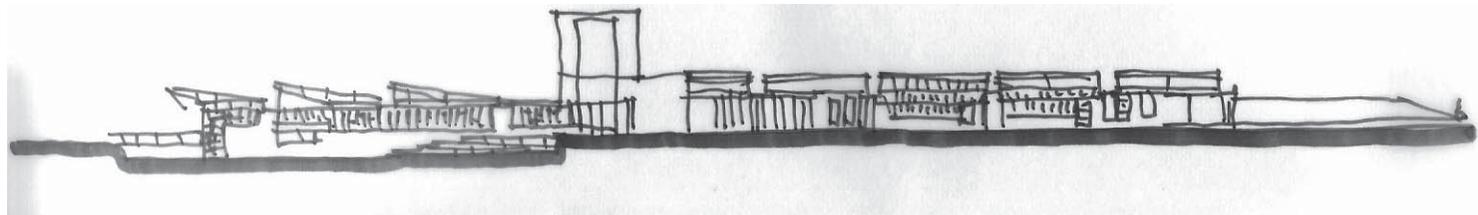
West elevation showing monopitched roofs and central entrance to bridge.
